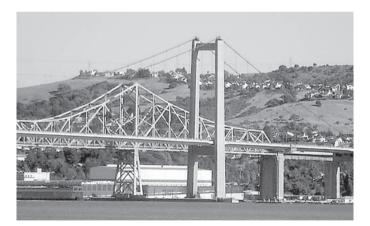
The newest Carquinez Strait Bridge, a suspension bridge, was completed in 2003, adjacent to the second Carquinez Strait Bridge, which was finished in 1958.
